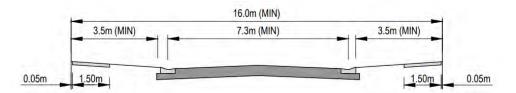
Typical Road Profile, Access Street (Local Government Infrastructure Design Association, March 2020)
